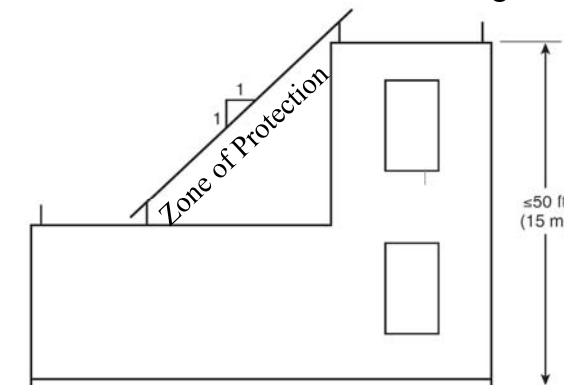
Lower Roof Protection for Flat-Roof Buildings 50 ft or Less in Height
